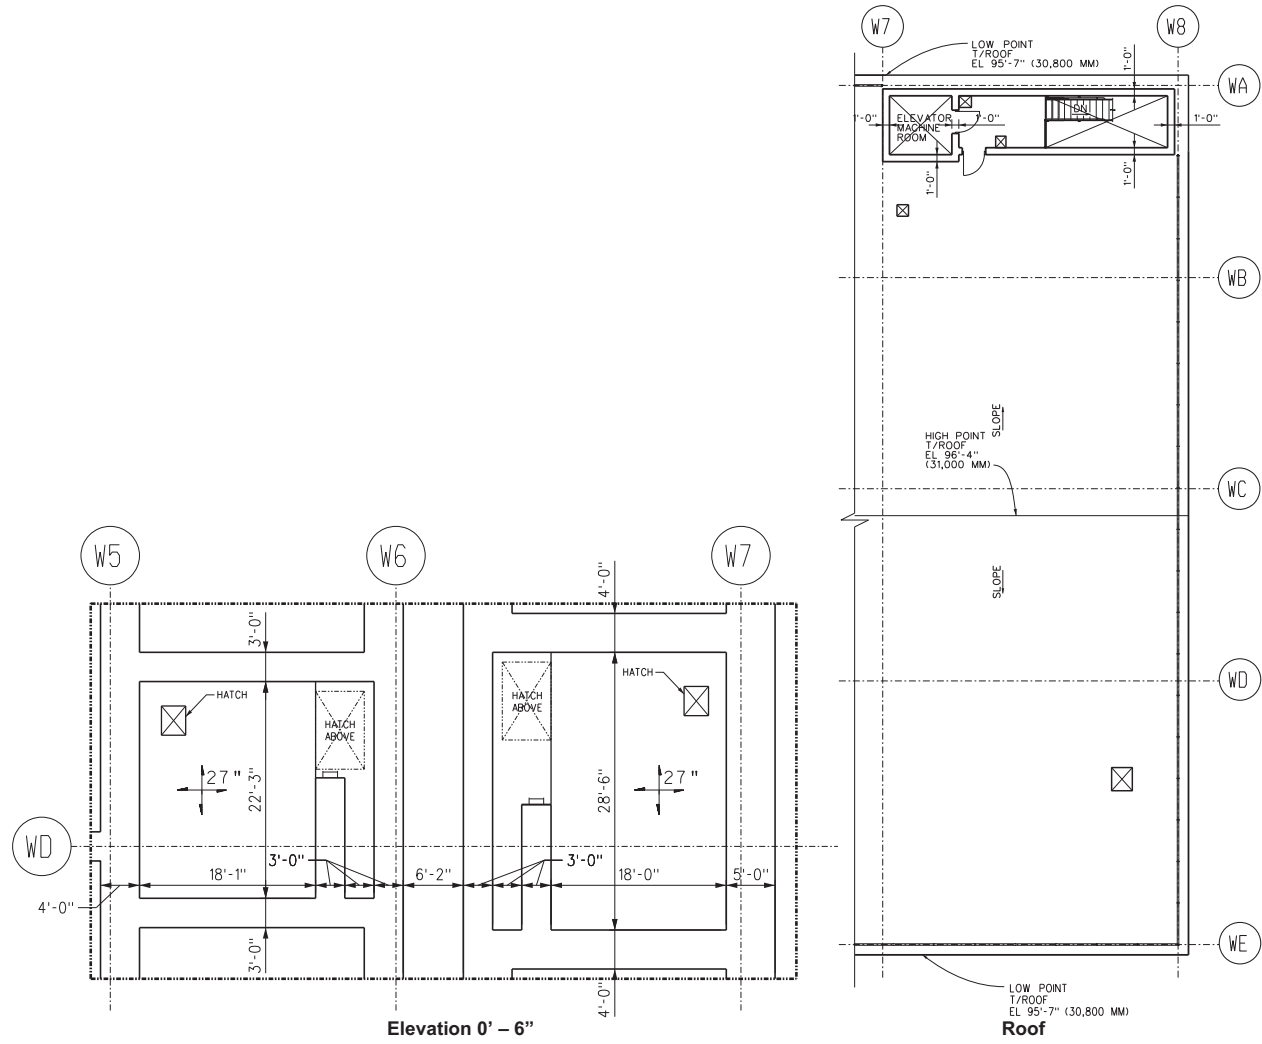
H.3-58 Radwaste Building Partial Floor Plans at Elevation 0'-6" and Roof
